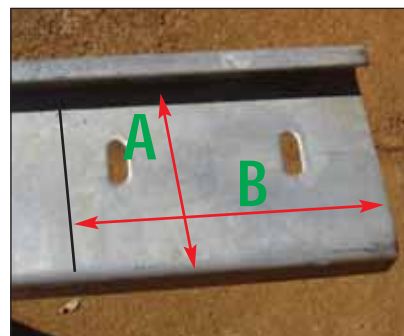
Mating surface on the outer face of the cable ladder at splices, both sides and both ends of cable ladder (4x)
